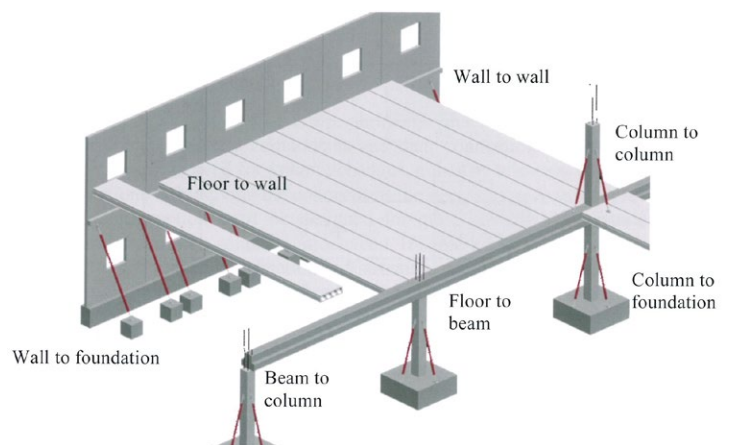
CONNECTIONS IN PRECAST STRUCTURES [9]
